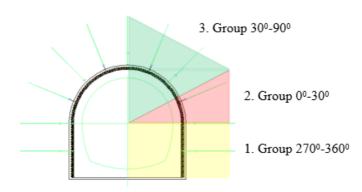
Typical rock bolt application pattern in a tunnel cross-section.
